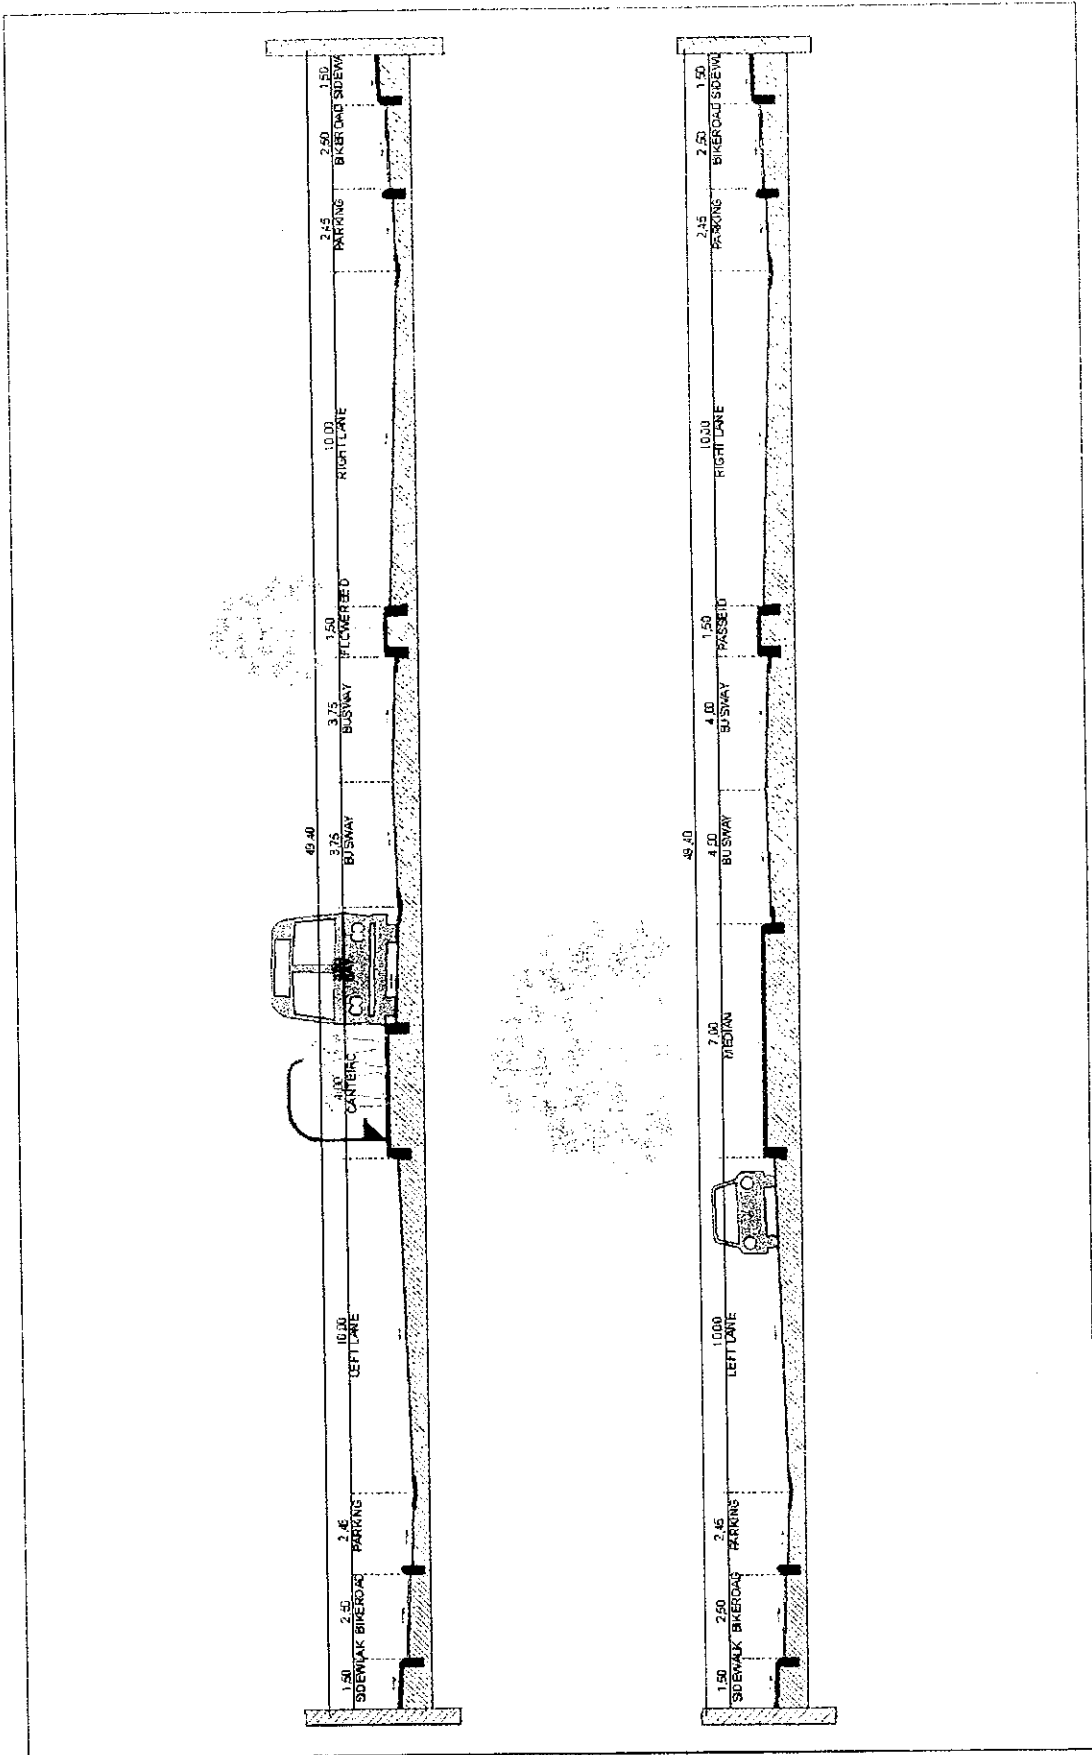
BR-316 Road - Detail of Transversal Section Type
